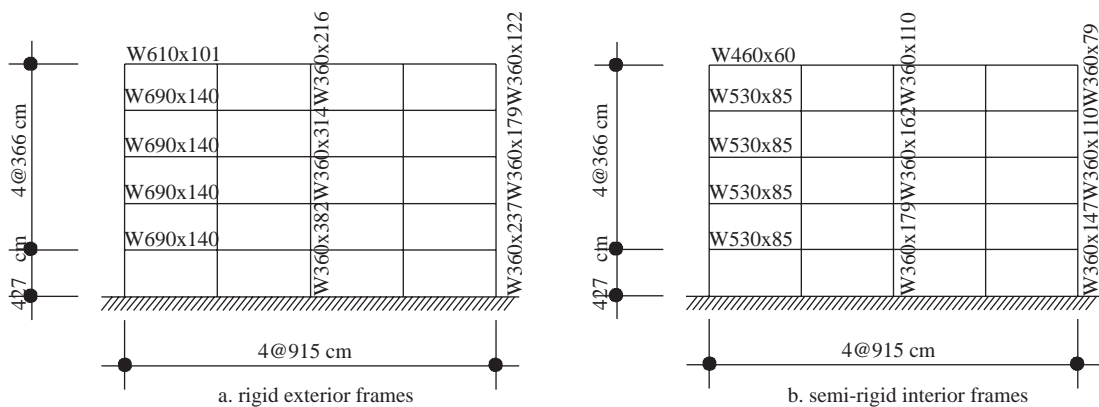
Elevation and member sizes of the 5-story building (Case 2).
